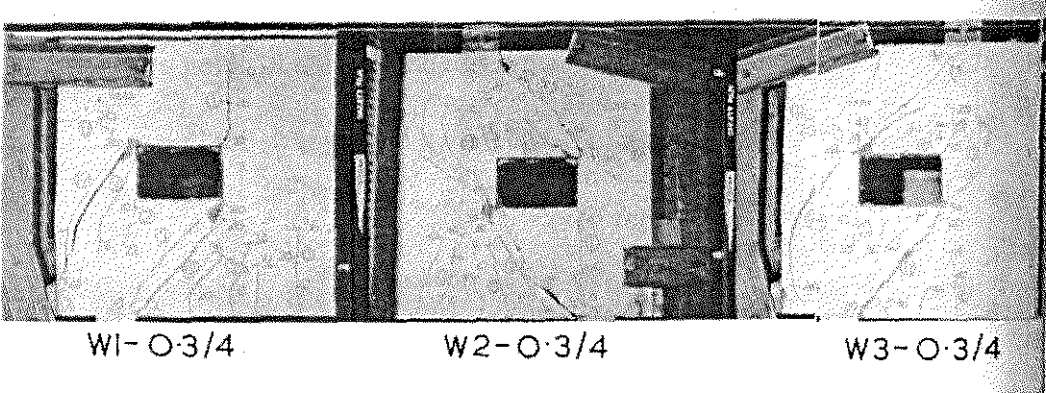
Vertical edge cracking patterns for beams with adequate horizontal reinforcement.
